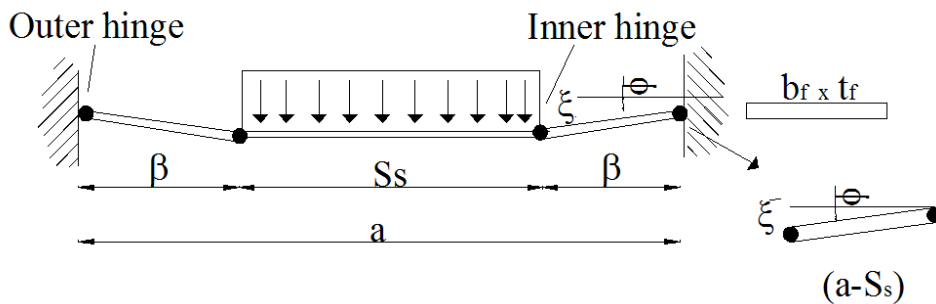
Adopted failure mechanism collapse for girders subjected to patch loading. Case of closely spaced transversal stiffeners.
